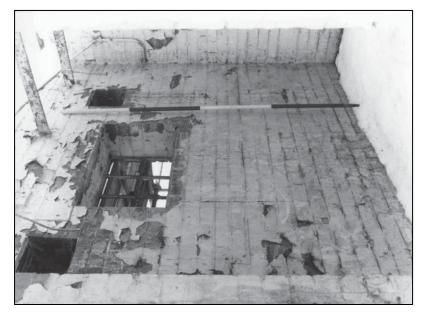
Building A, 1F SE corner room, looking SE (photo 8/5) (top to left).
